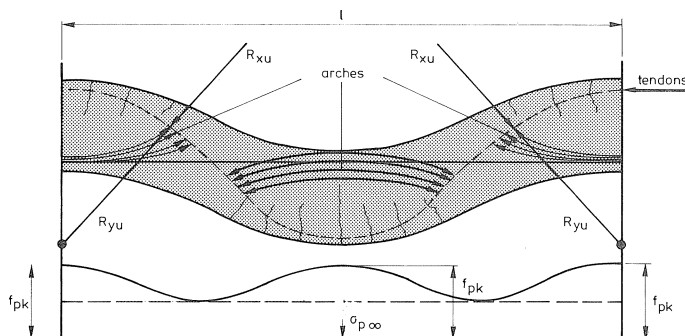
Transfer of load to support (no longitudinal reinforcement).
